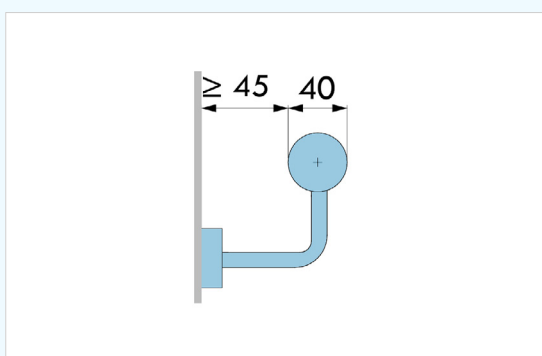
Round handrail shape with a diameter of 40 mm (recommended 25–40 mm). The distance from a fixed structure is 45mm.
